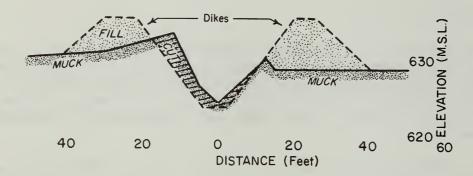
TYPICAL SECTION OF FLOODWAY
